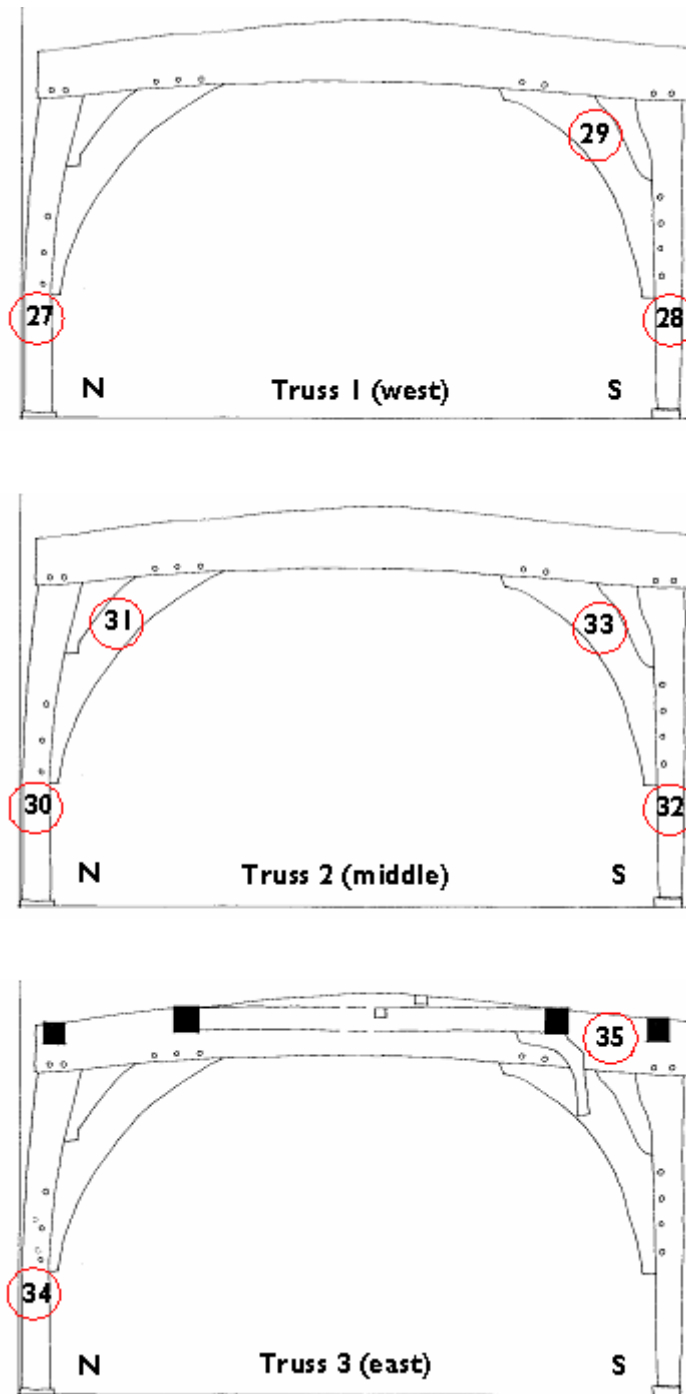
Cross-section of the bell frame trusses to show sampled timbers (after Martin Roberts)
